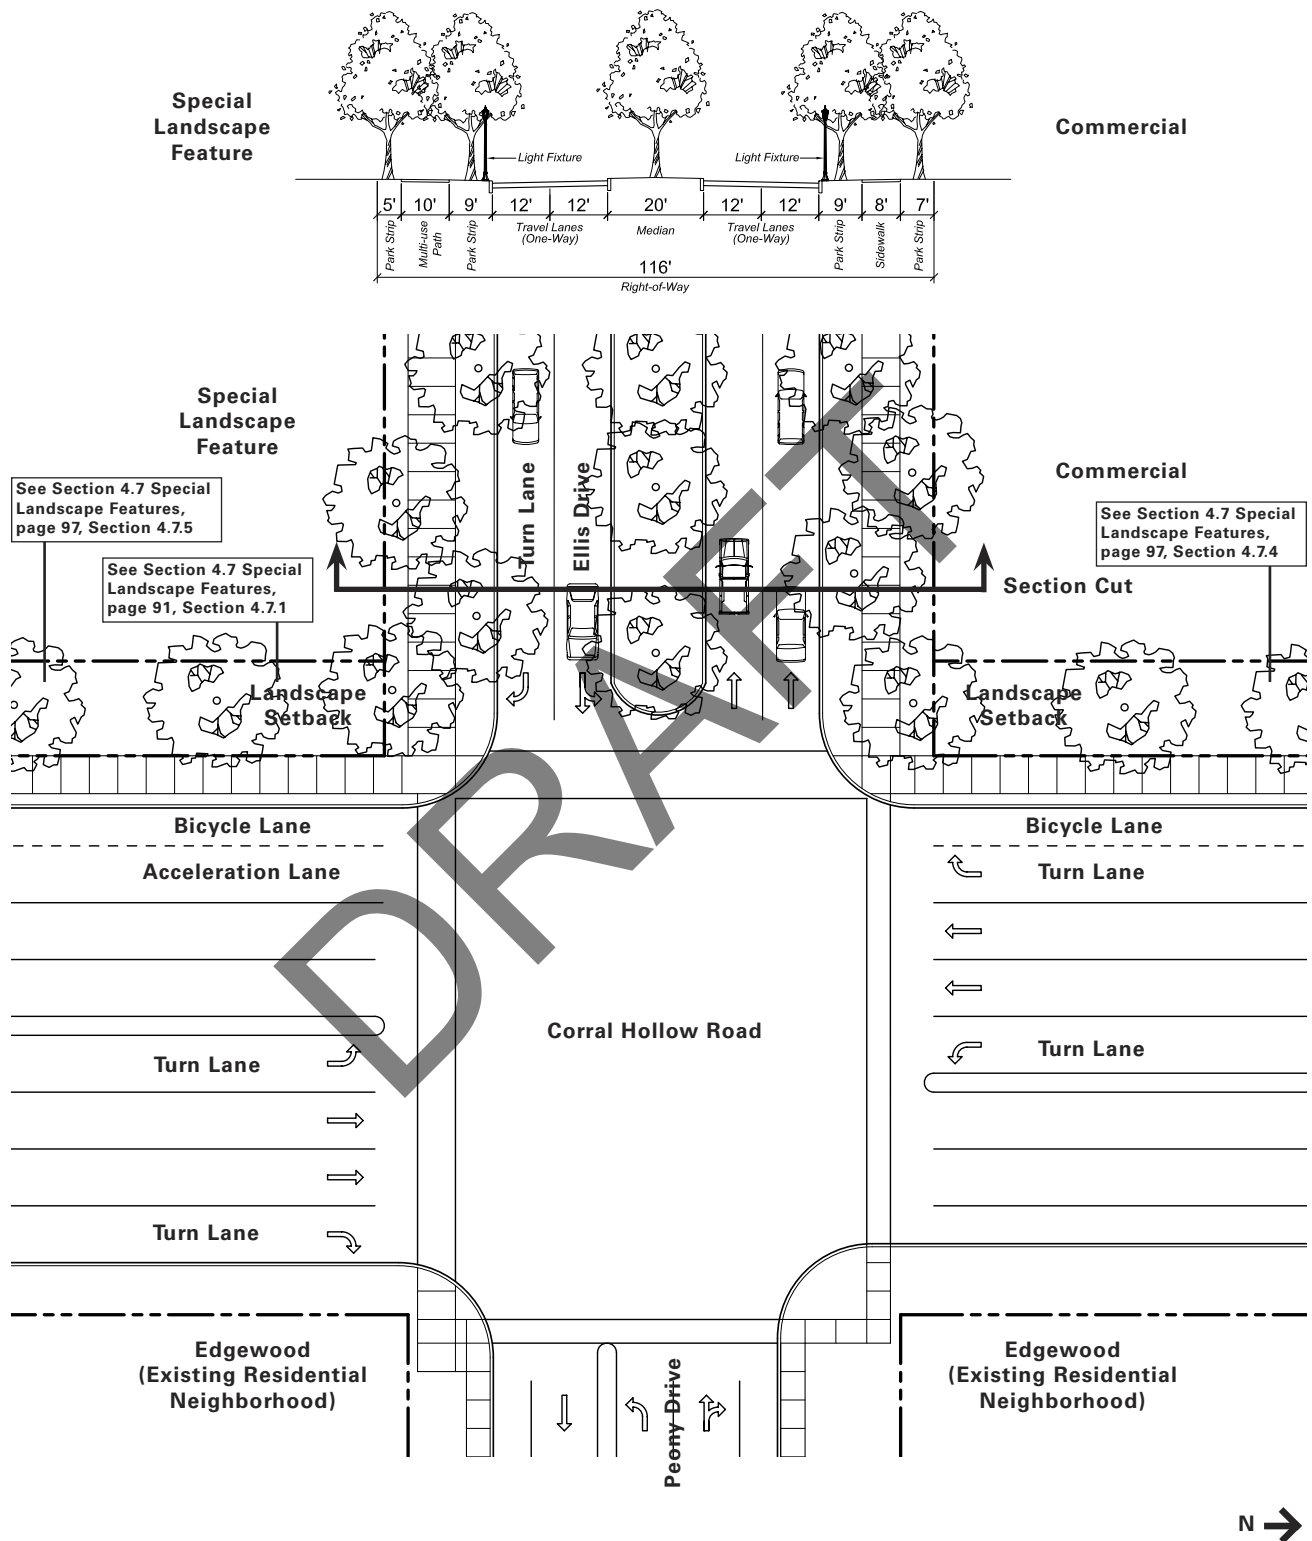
Proposed Section and Plan: Entry Street C (Ellis Drive)
